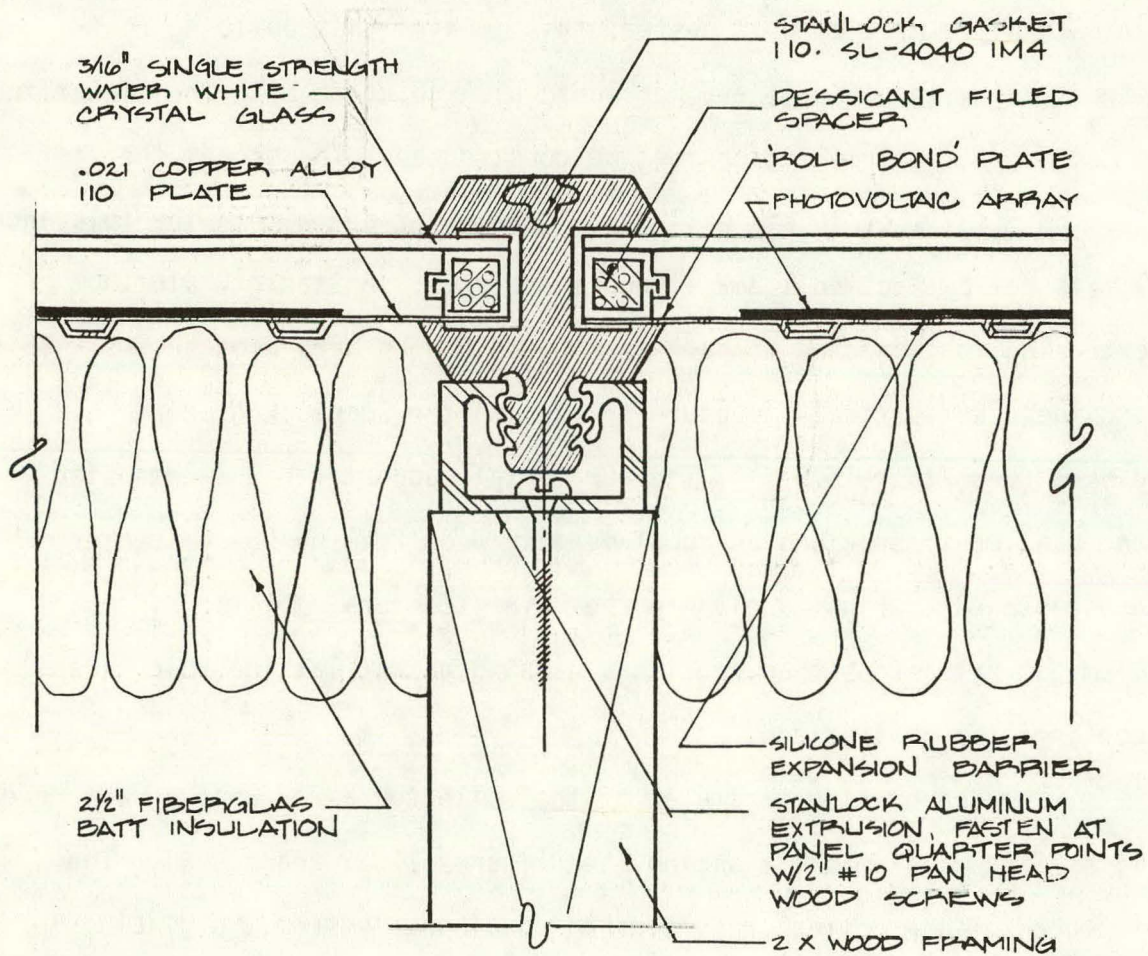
RPS proposed collector framing sloped joint detail
